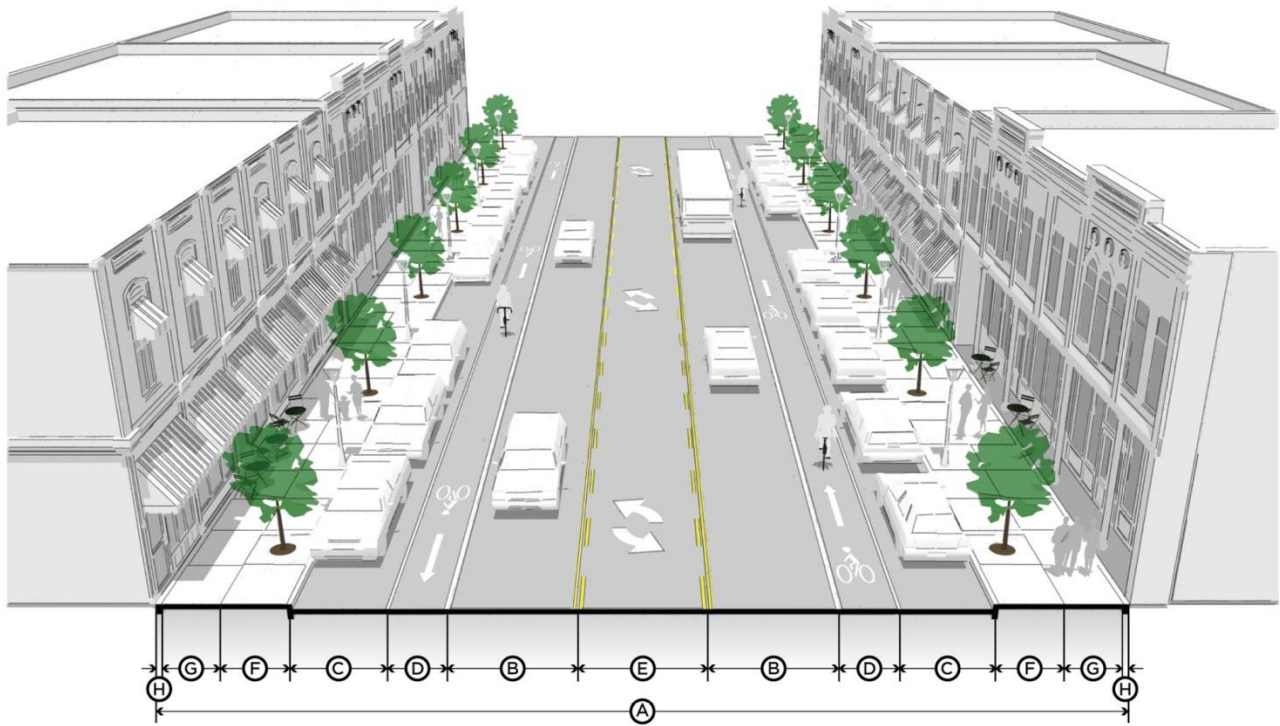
COLLECTOR: TWO-LANE UNDIVIDED
